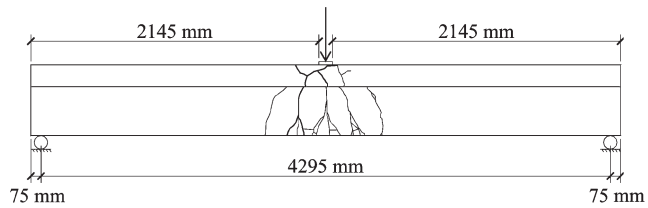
Test setup and crack patterns for multiple-strand development length specimen HPC-2 (south face).
